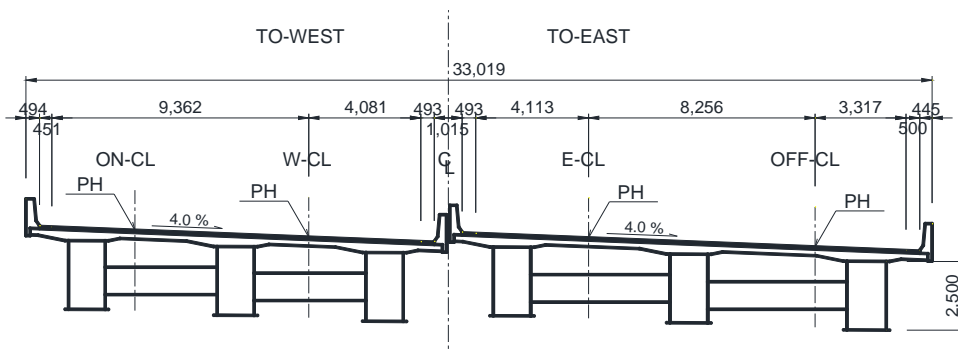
(2) Typical Cross Section of Widening Bridge Section
